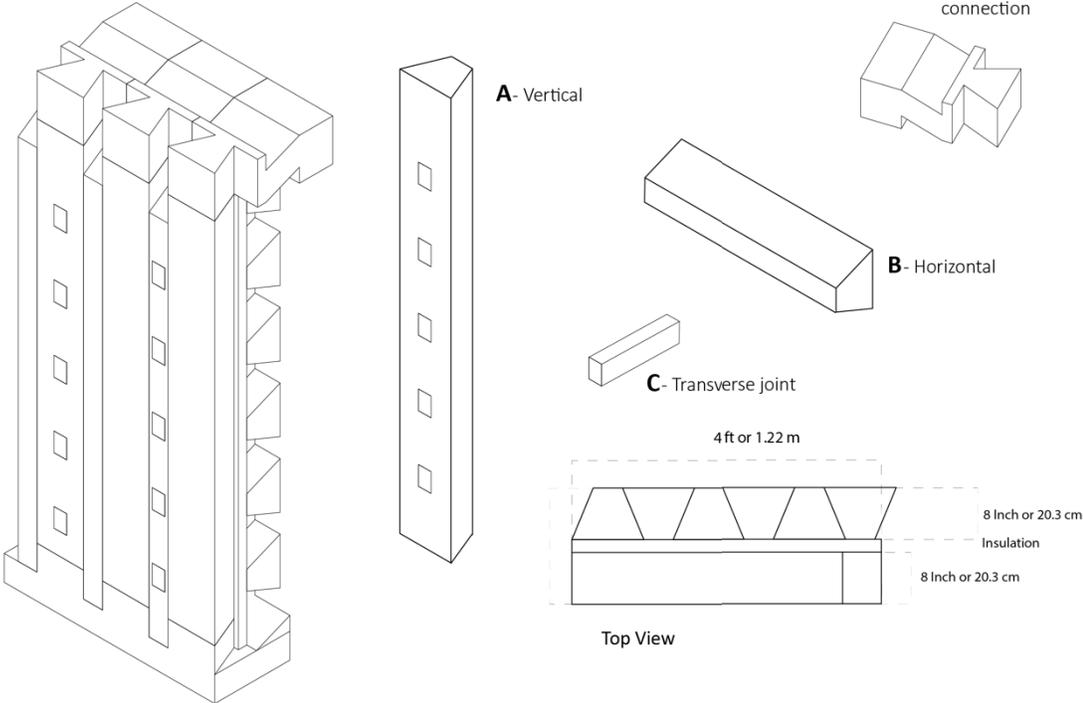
Prototype three, Panel parts and assembly (2018)
